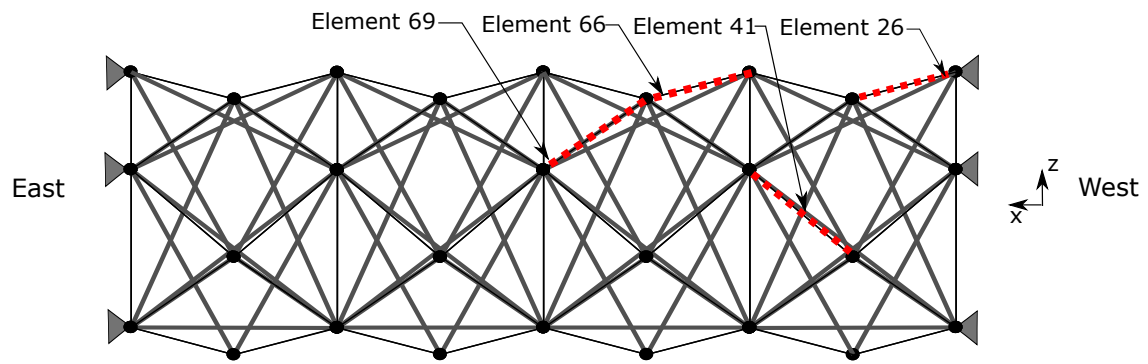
Elevation sketch of deployed and connected structure. Cables involved in the rupture study (Elements 26, 41, 66 and 69) are shown.
